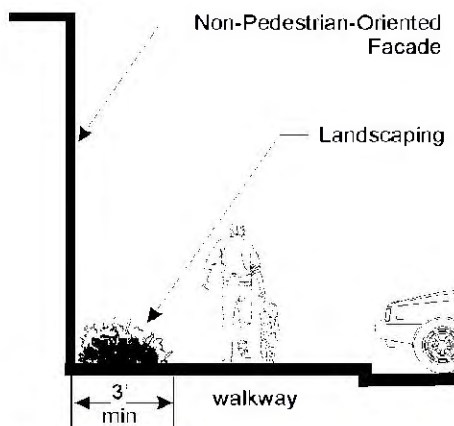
C.1.1-1 Provide landscaping between walkways and structures except in front of Pedestrian-Oriented Façades.
